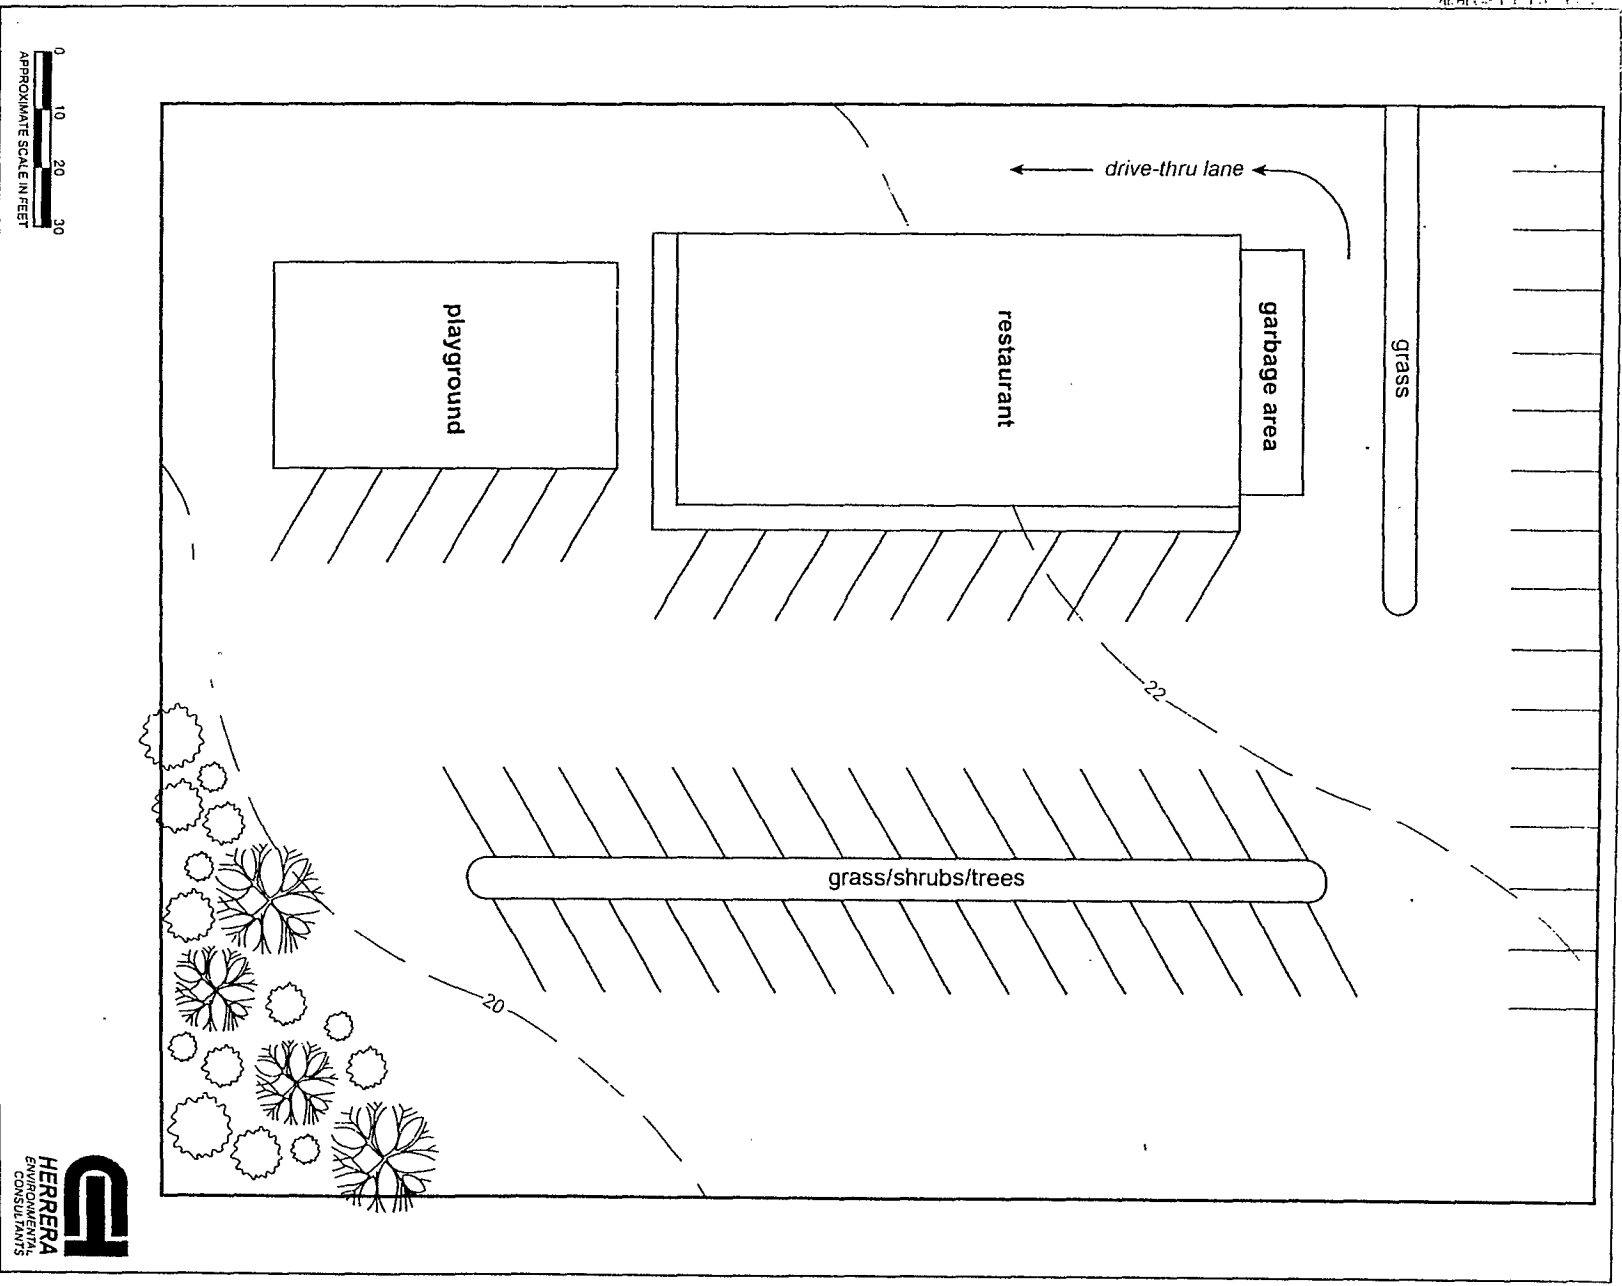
One-acre commercial development plan, without stormwater facilities, superimposed on natural (pre-development) topography and drainage features.
